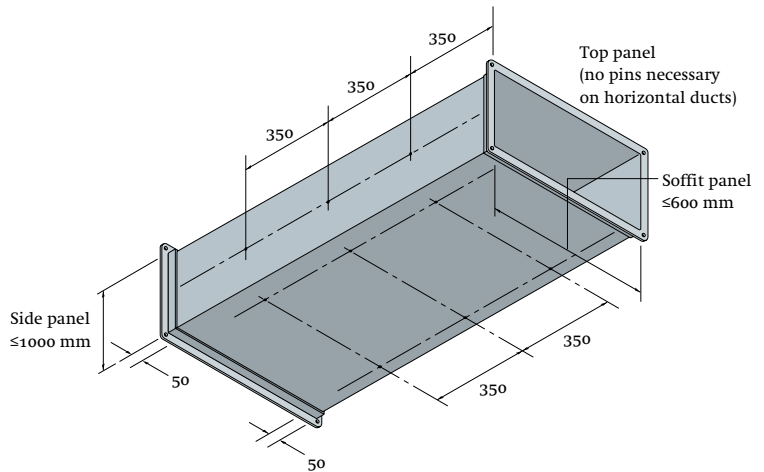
Steel pin arrangement where side panel does not exceed 1000 mm and soffit panel does not exceed 600 mm
